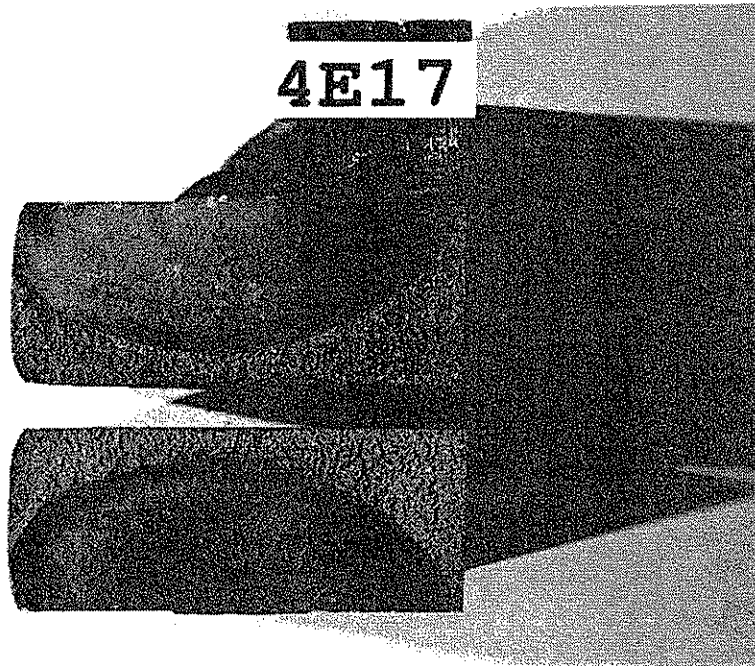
Fatigue crack at coverplate end weld detail 4E17.
